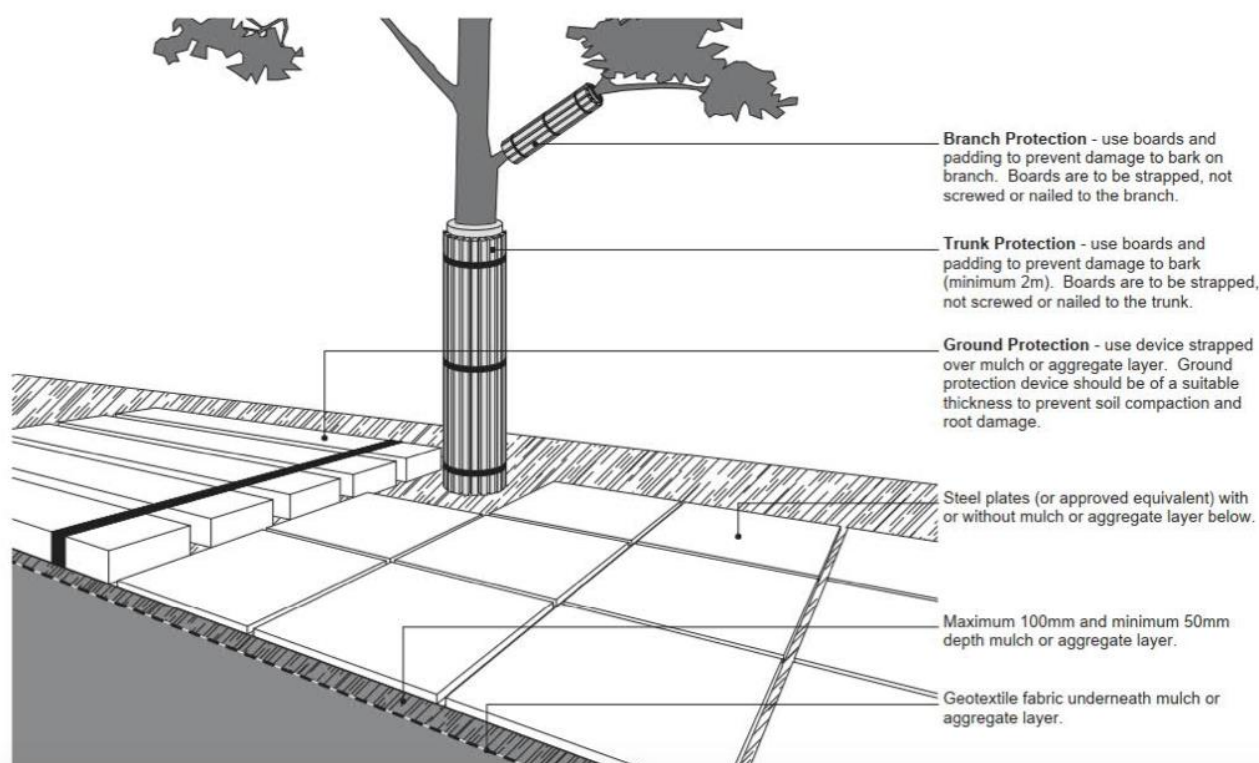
ground, trunk, and branch protection diagram (Jacobs Australia PTY LTD, 2019)
